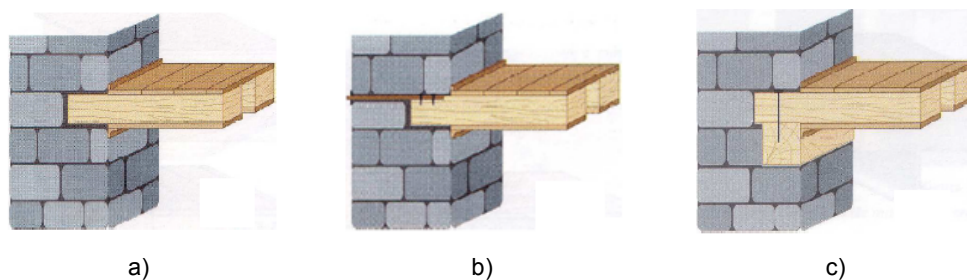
Connection between the floors and the masonry walls (Appleton, 2003): a) Beams simply embedded on the wall; b) Beams embedded and anchored to the wall by steel nails; c) Introduction of a regular stone or a timber beams on the wall to support the beams.
